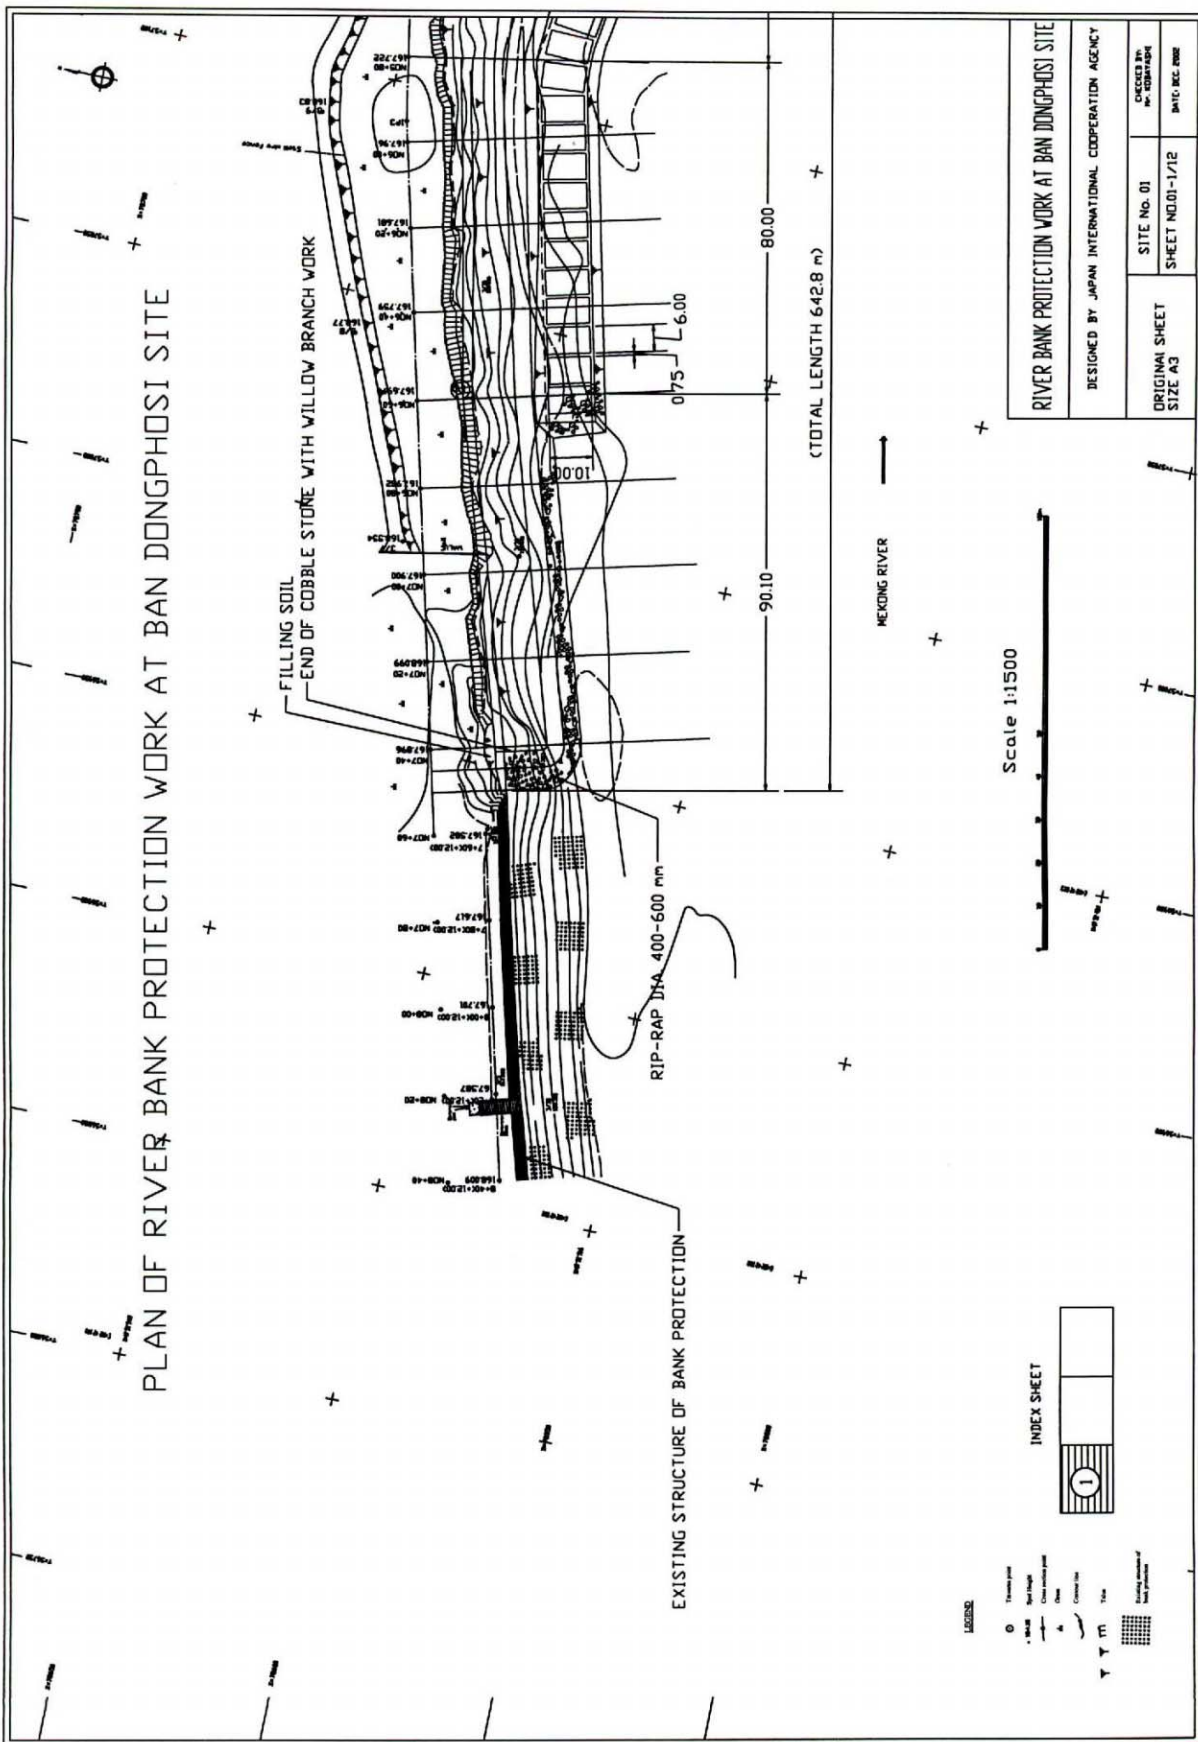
(1/3) Plan of Riverbank Protection Work at Ban Dongphosi Site
